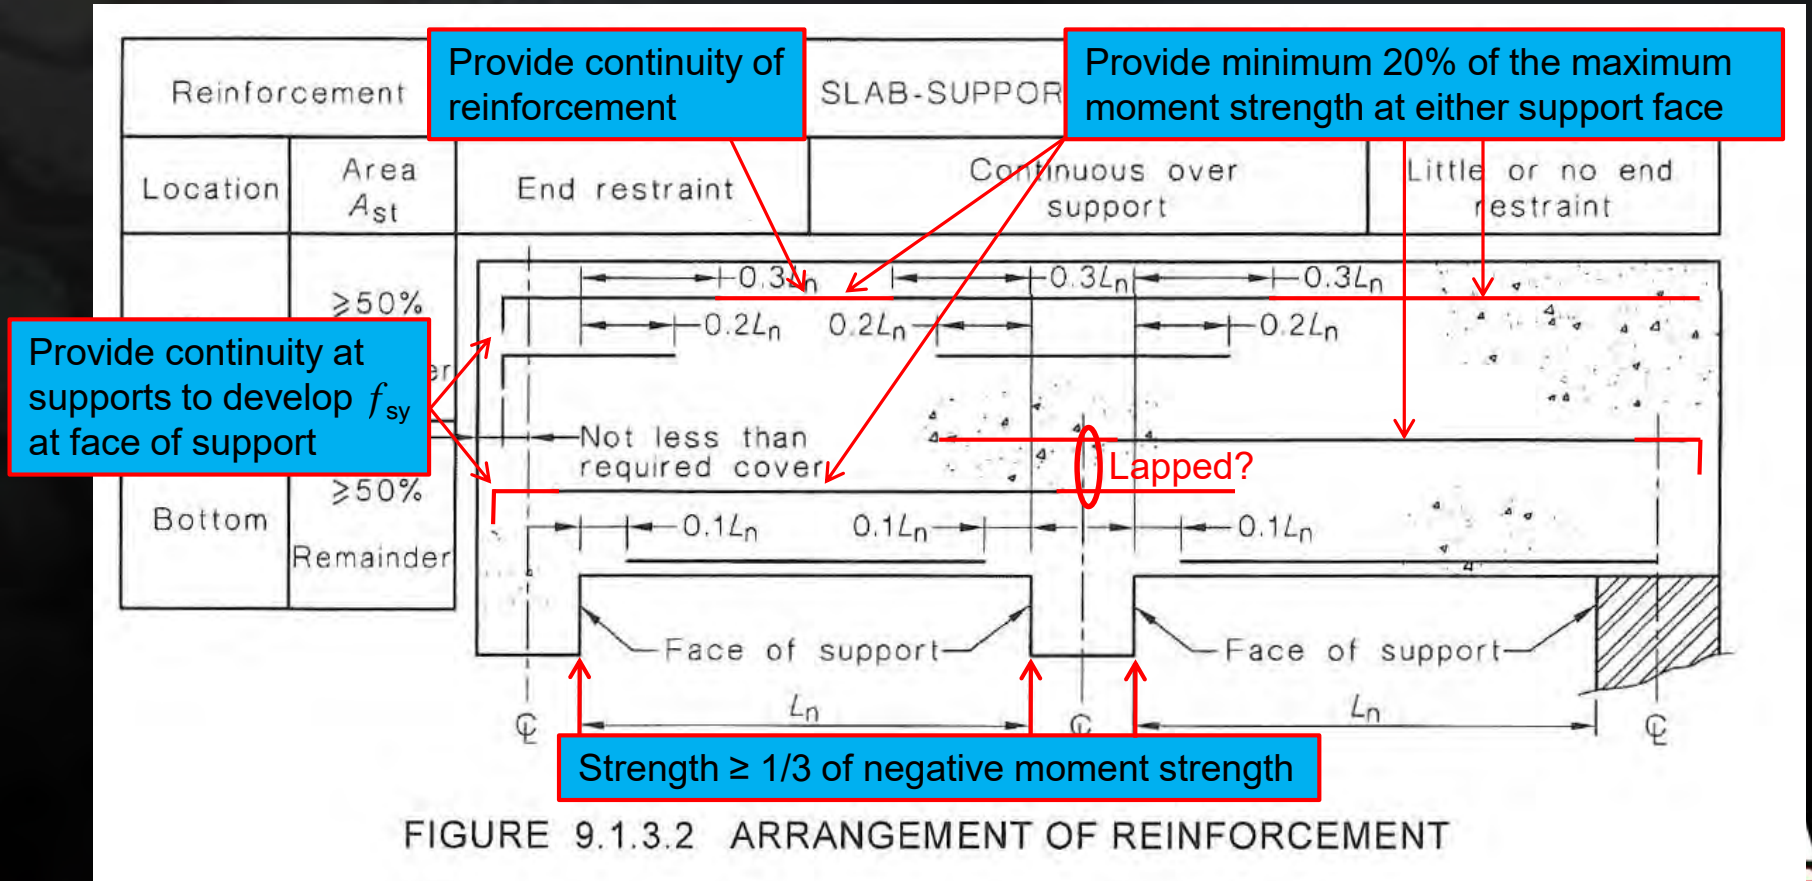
ARRANGEMENT OF REINFORCEMENT
